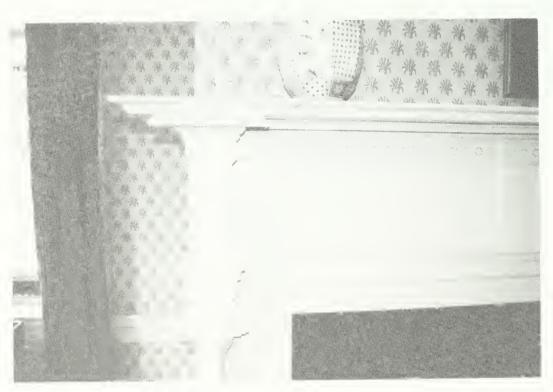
Dining room (Room 103), north-wall mantelpiece detail.
